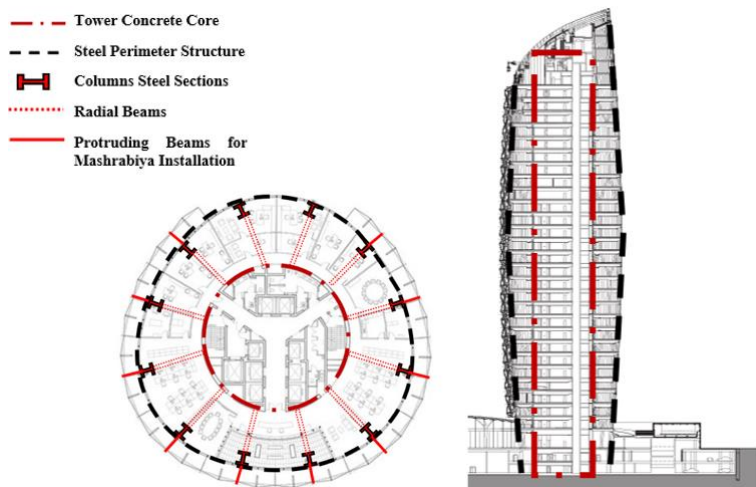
Components of the structural system of the tower (LINE 2020) (Edited by Author)
